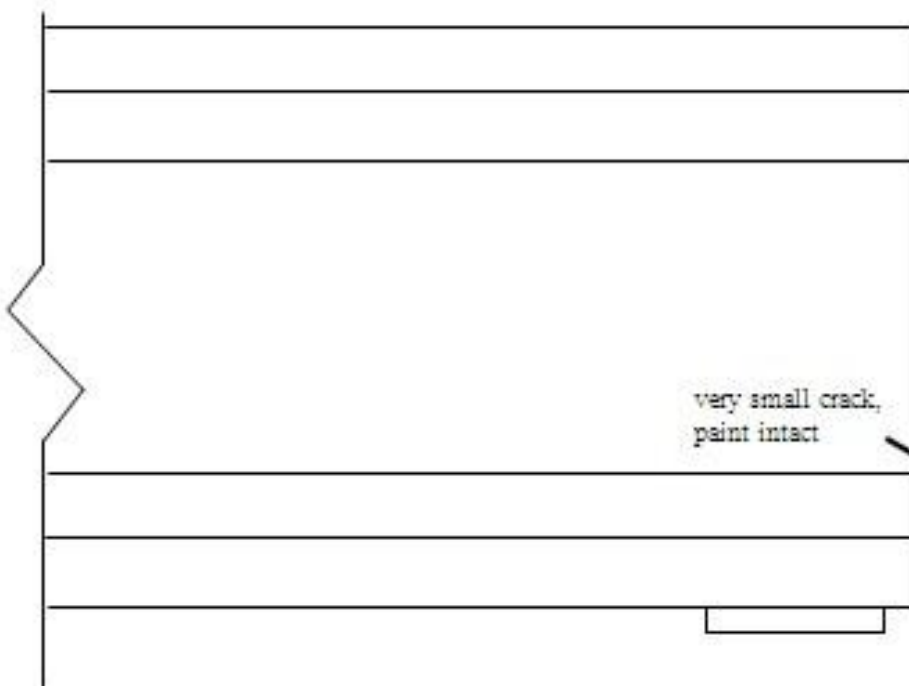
Crack diagram, exterior girder on east side, east face, north abutment (#1829).
